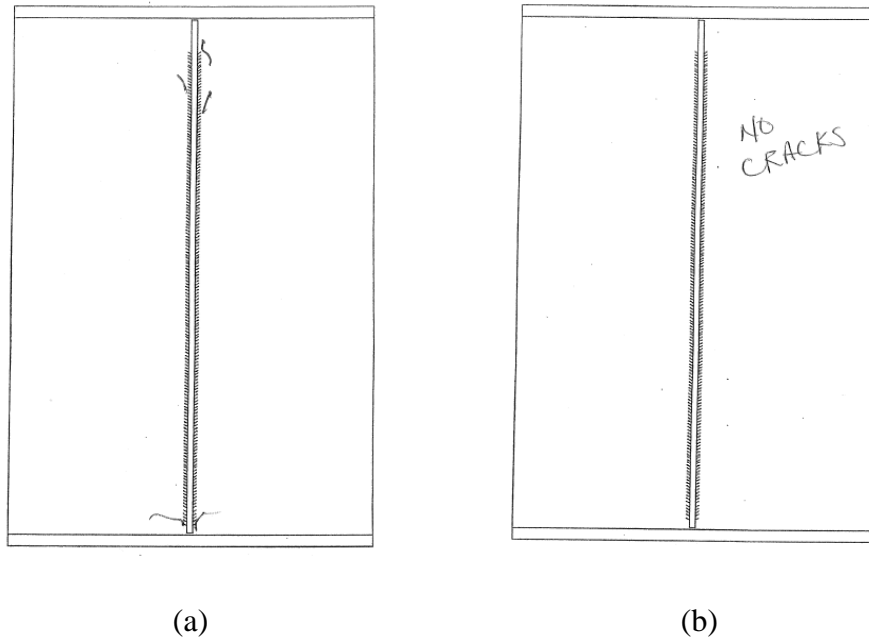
Realtime inspection results in the girders of the POD frame: (a) specimen with reported fatigue cracks (b) specimen with no reported fatigue cracks
